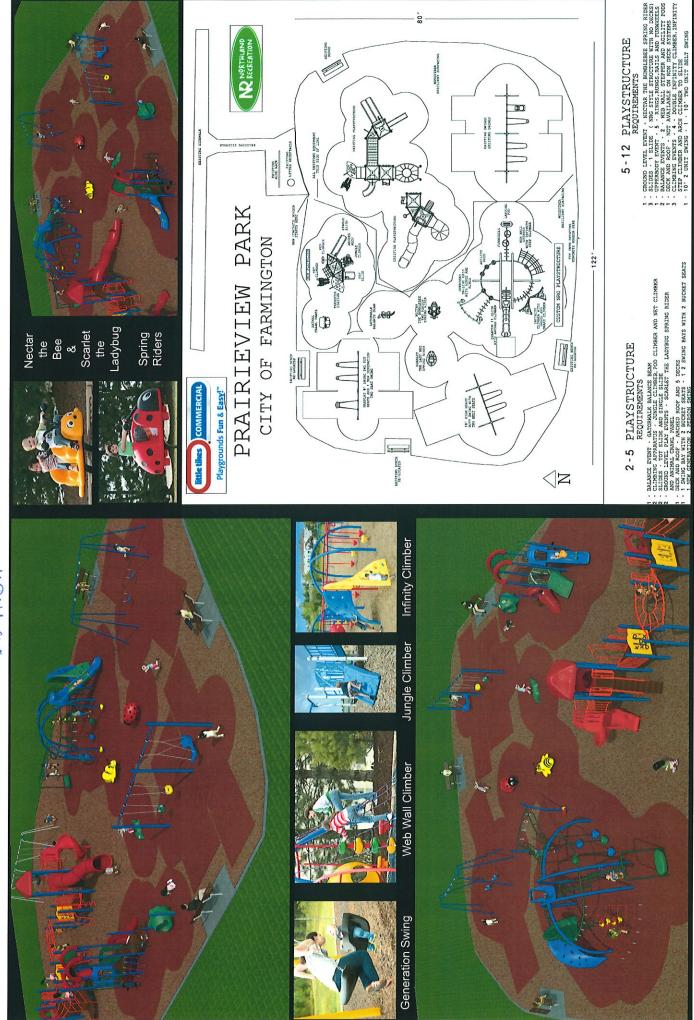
Exhibit C Prairieview Park Playground Equipment Installation Tabulation
